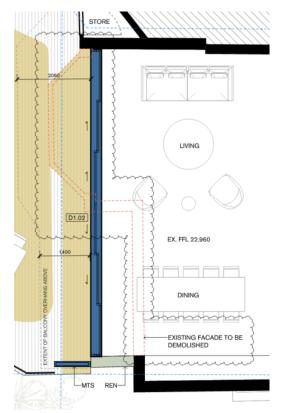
Extract of the proposed lower ground floor plan, existing façade shown in dashed red line (Source: Tzannes)
